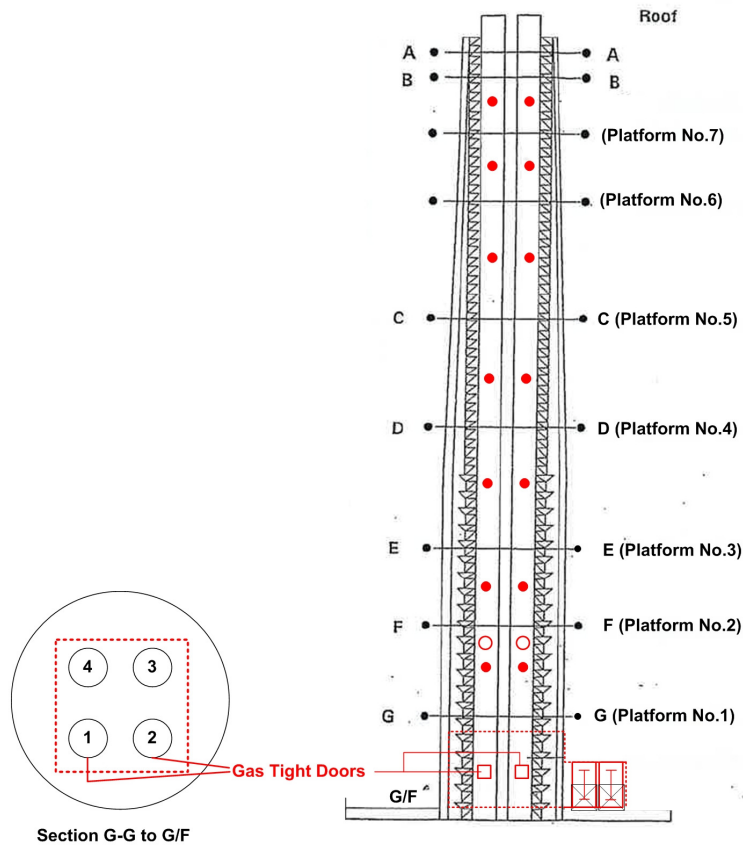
Layout Plan of Asbestos Abatement Work in Chimney - Asbestos Gastight Door Sealant
